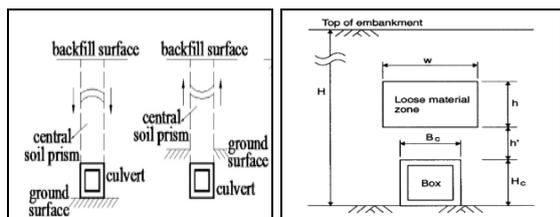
Installation of Embankment, Trench and Imperfect trench culvert
